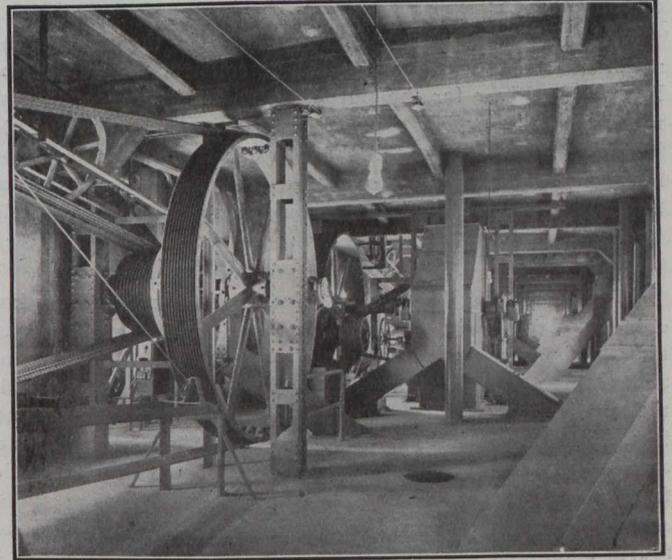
View of Top Floor Showing Elevator Heads and Drive.
